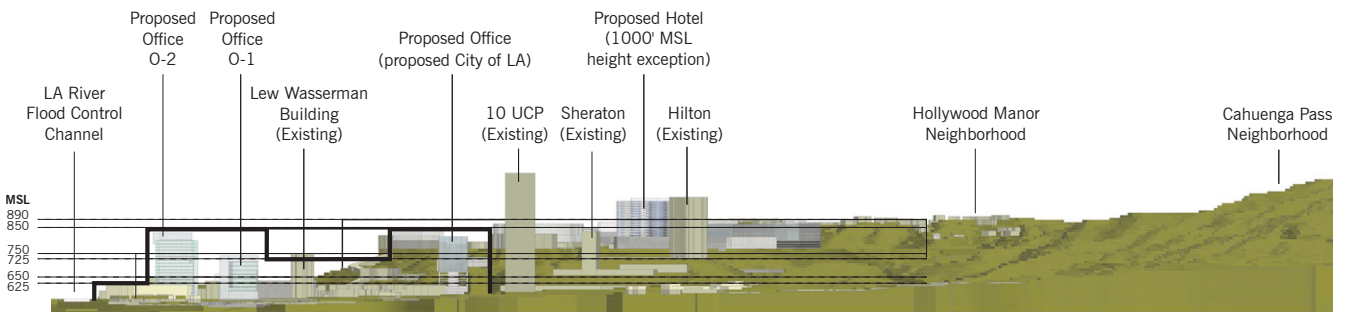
Conceptual Plan and Height Zones West Elevation
